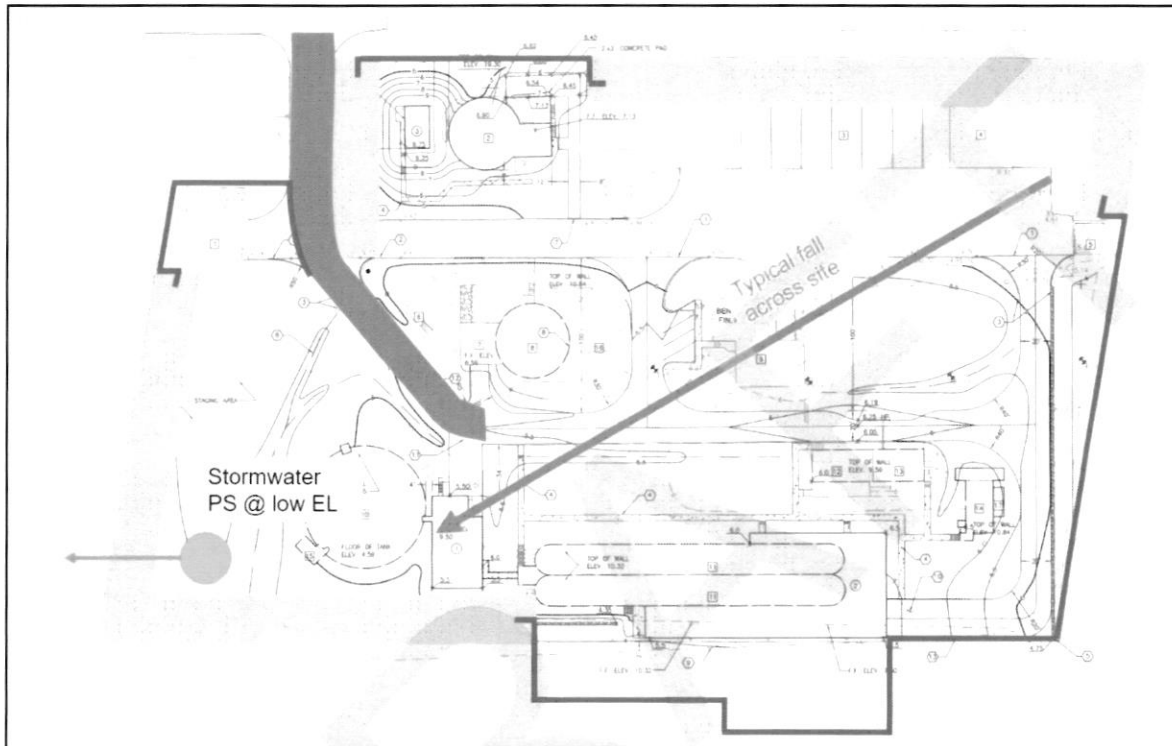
Option 1, Stormwater Discharge Pump Station Concept Arrangement, Plan View
